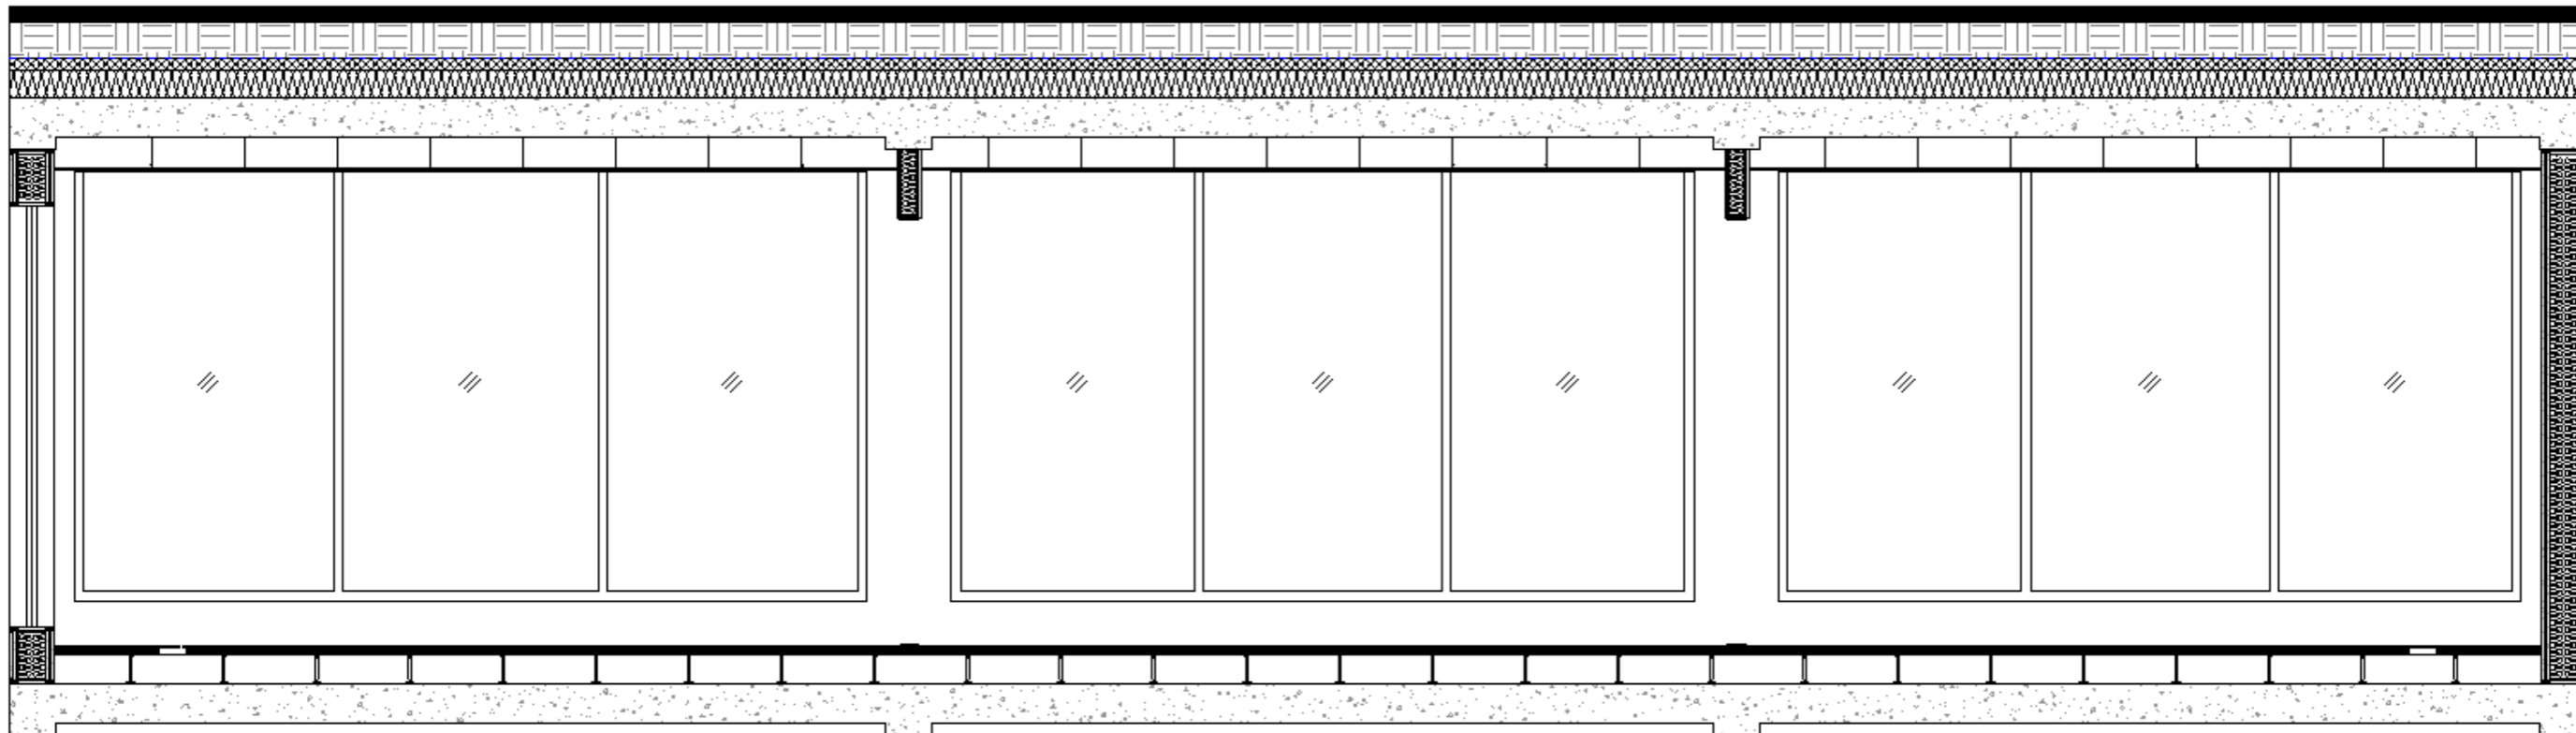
Enlarged Multi-Function Room Section (Author, 2021)
